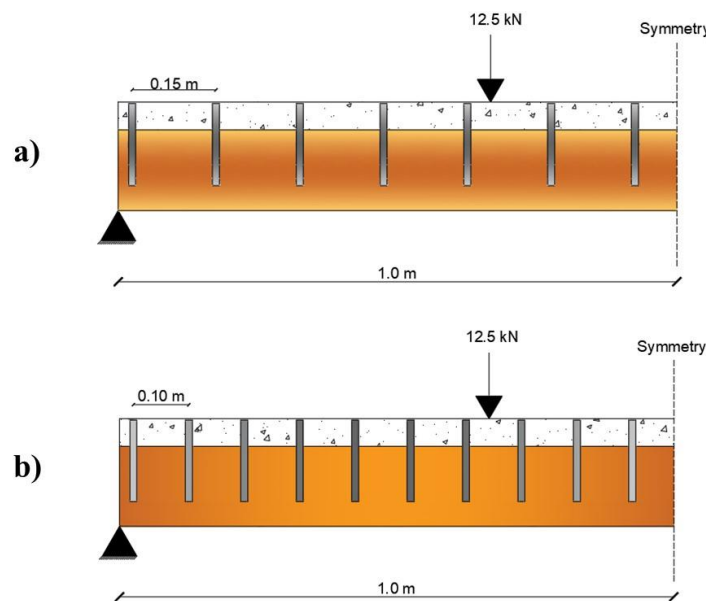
Geometry and design of: a) beam 1 and b) beam 2
